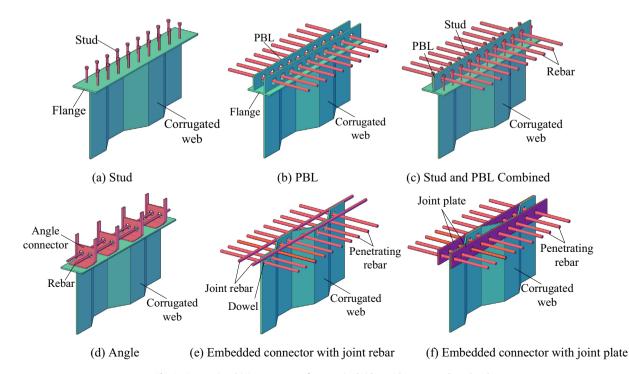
Conventional joint structure of composite bridge with corrugated steel web.
